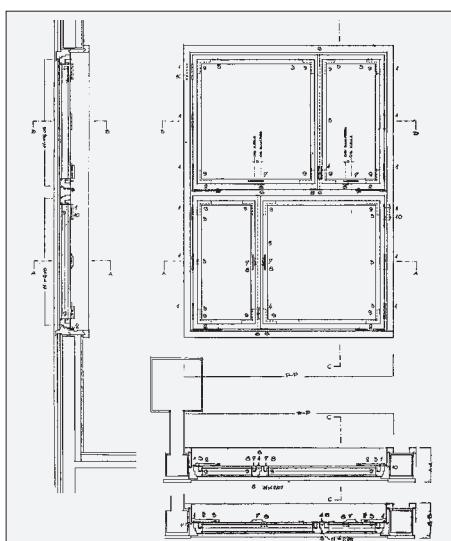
FACULTY OF TECHNOLOGY IN ZAGREB, DETAIL OF THE WINDOW FROM THE SIX-STORY BUILDING (RIGHT)
